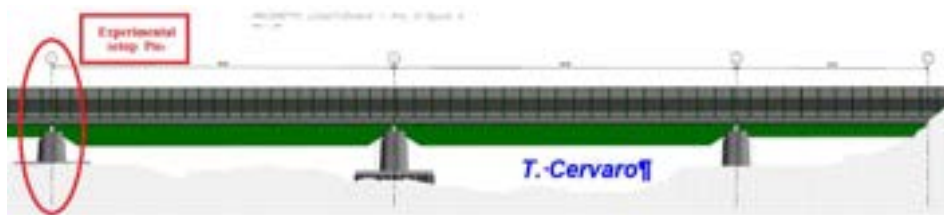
Elevation view (Pier 3 – Abutment A) of the designed viaduct over the Cervaro River
